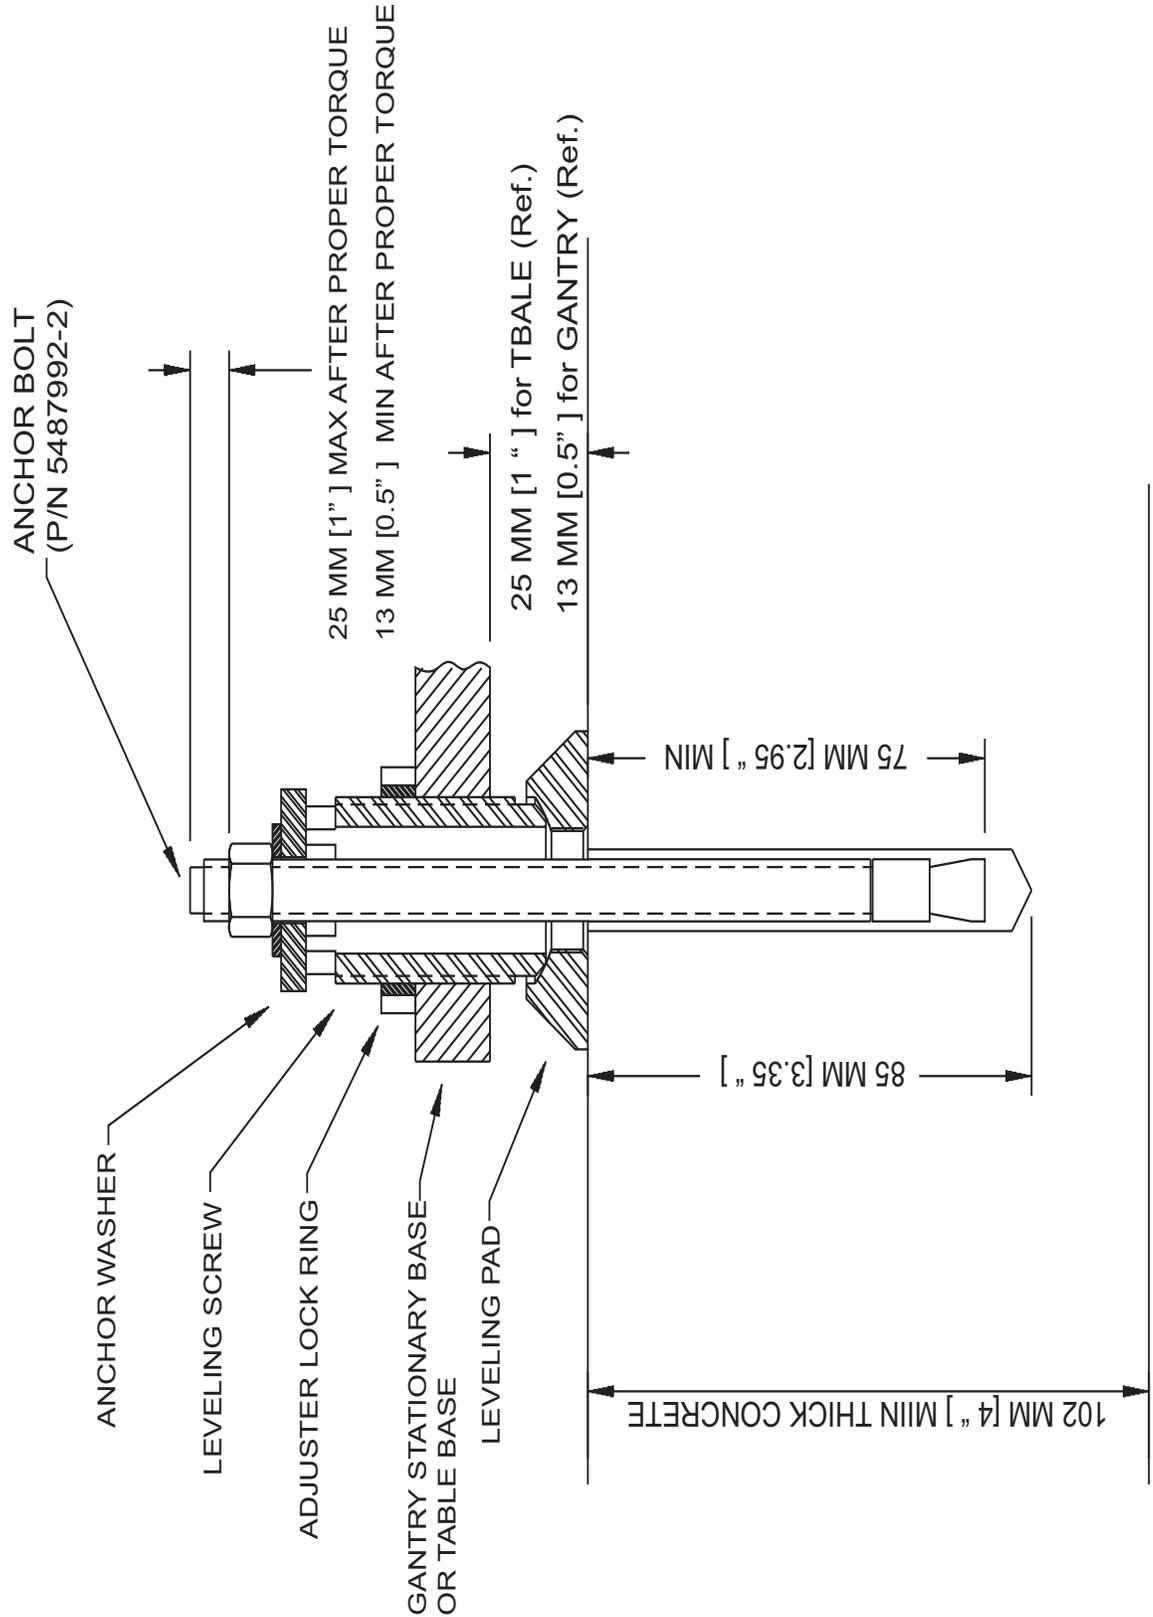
Gantry and Table Anchoring with 5487992-2 (7 in.) Anchor Bolt (GT 1700)
